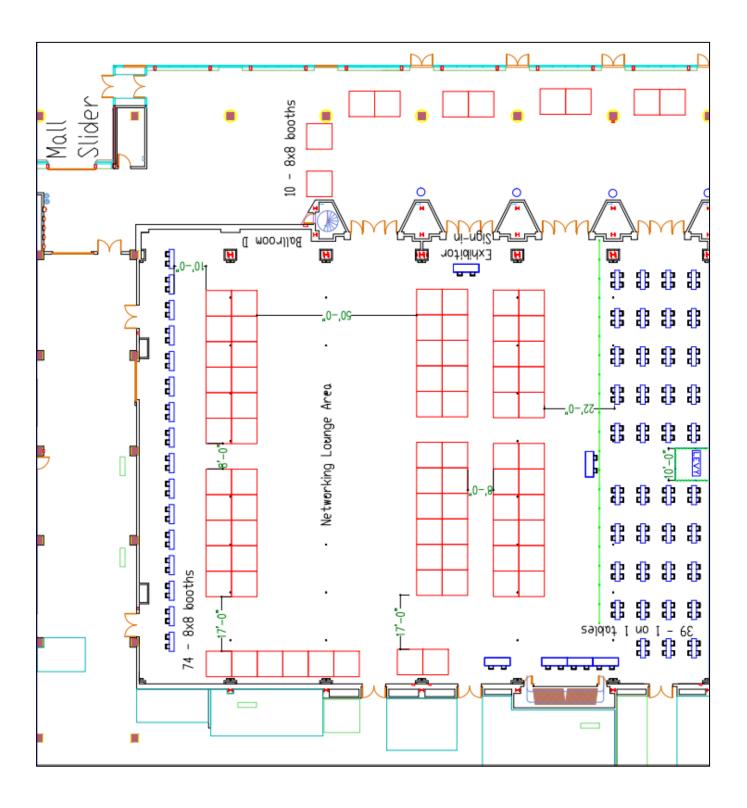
Ballroom Floor Plan from 2023 (Ballroom AB, 1st Floor)
